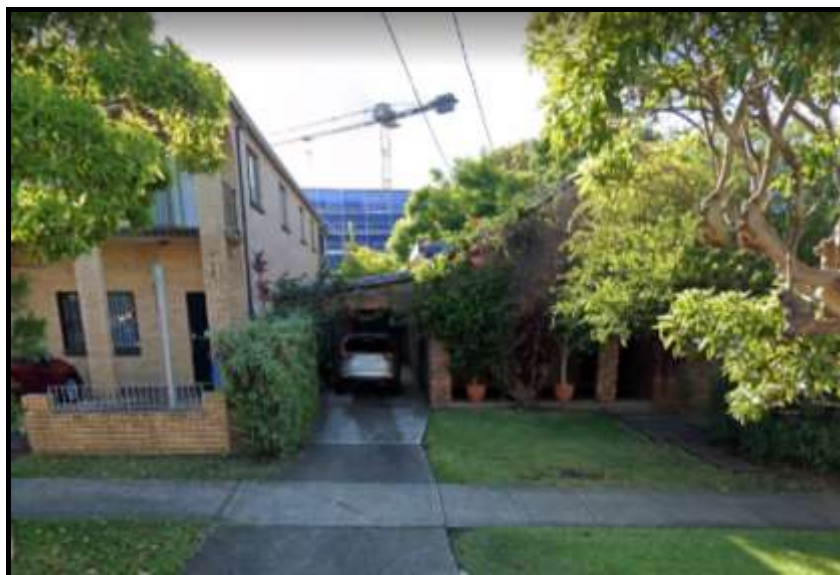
Adjoining development to the west - No 60 Harris Street (Source: Planning Consultant, March 2022)
